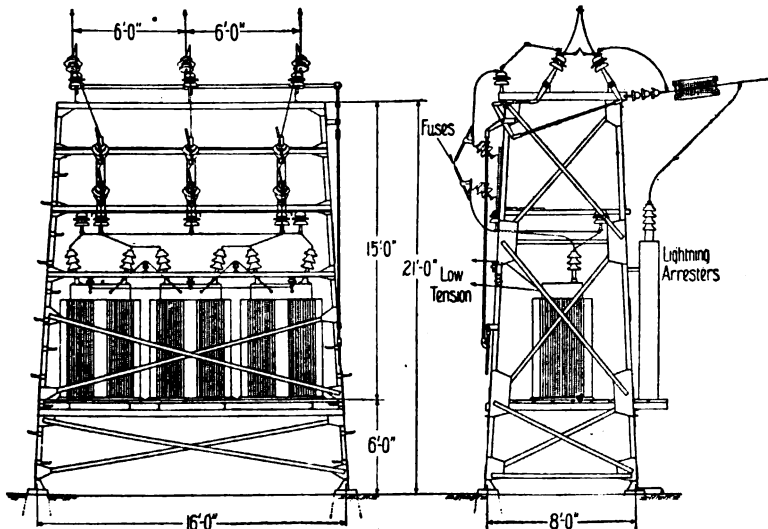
TYPICAL 37,000-VOLT OUTDOOR SUBSTATION
